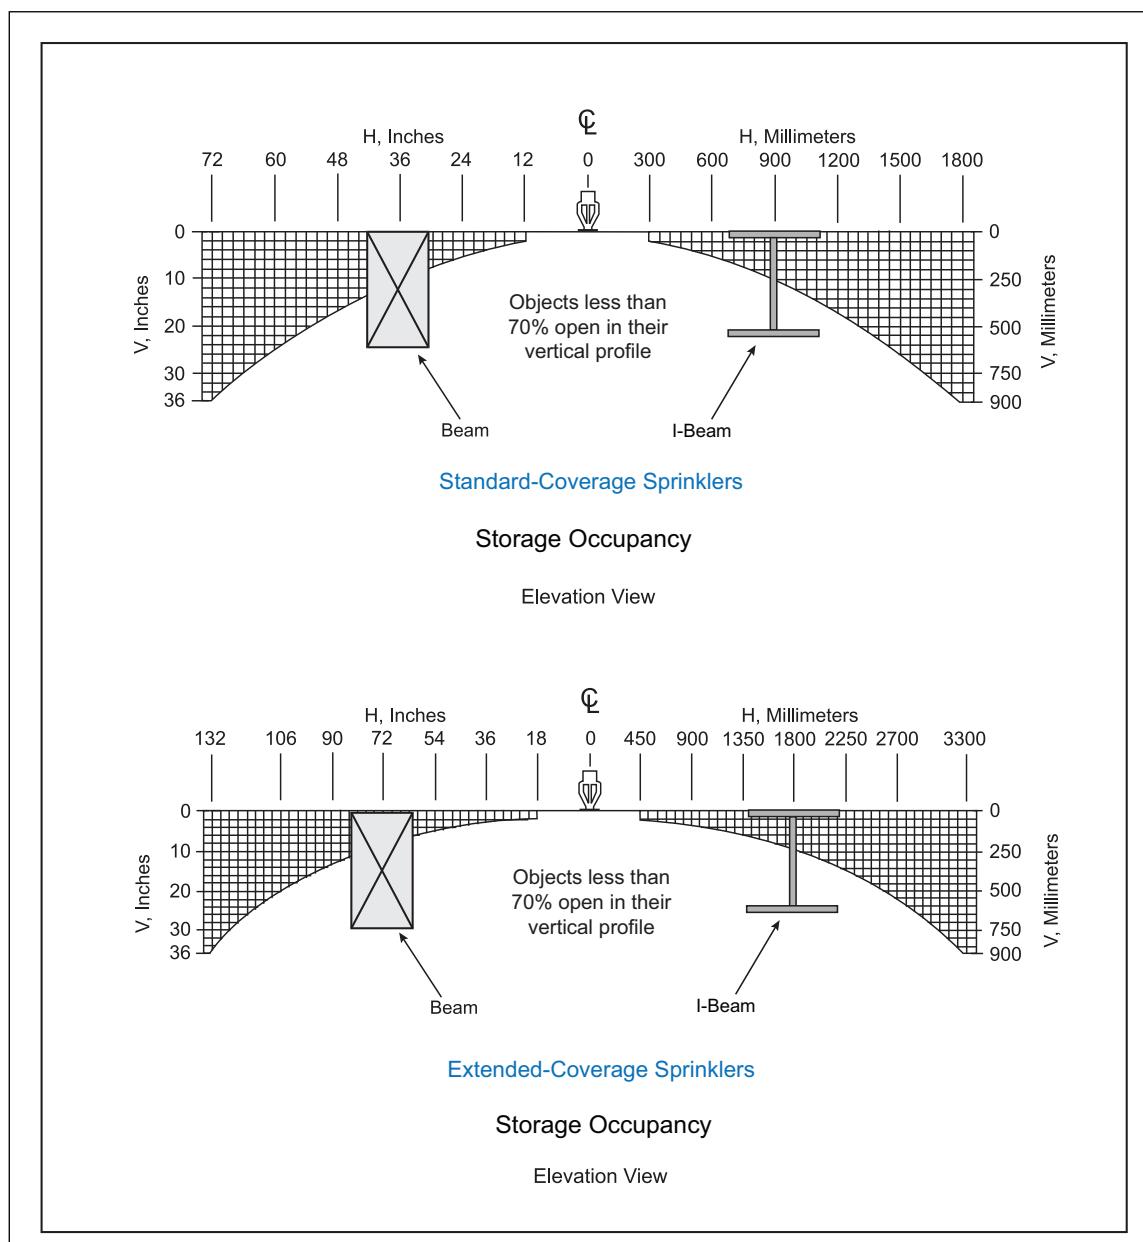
(a). Example of ceiling structural members that obstruct sprinkler discharge pattern
